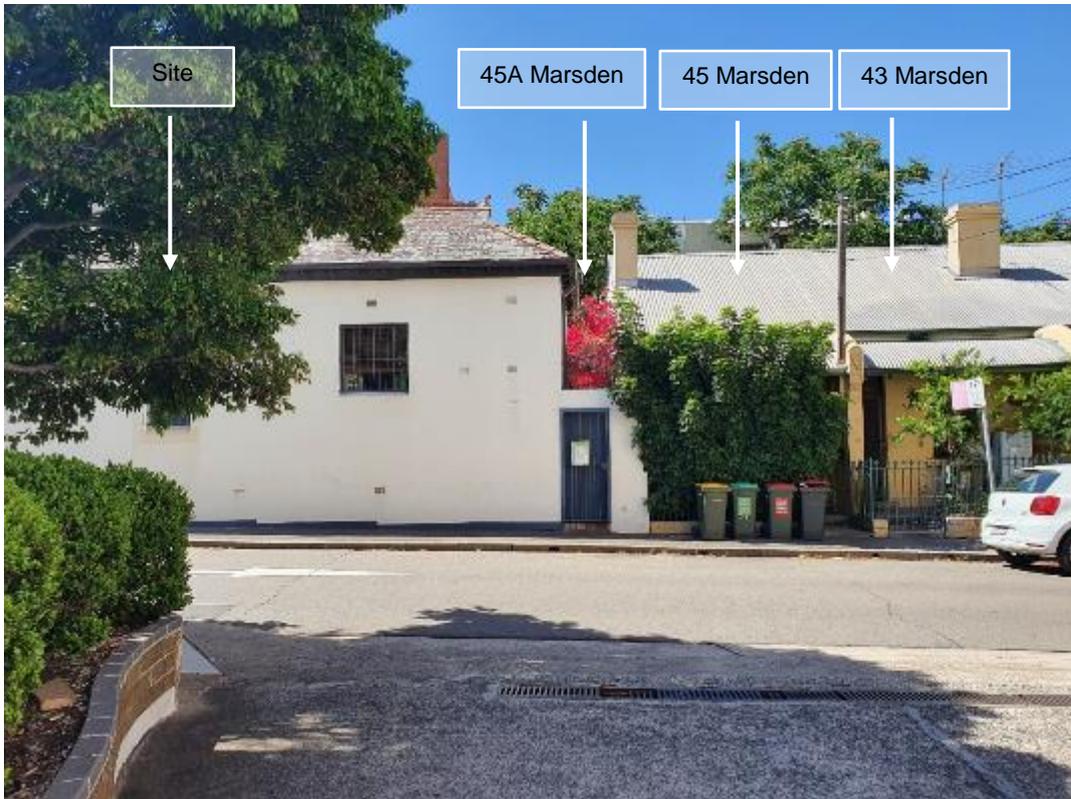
Adjoining properties west of the site showing narrow strip of land known as 45A Marsden Street and part of the terrace row at 43-45 Marsden Street
